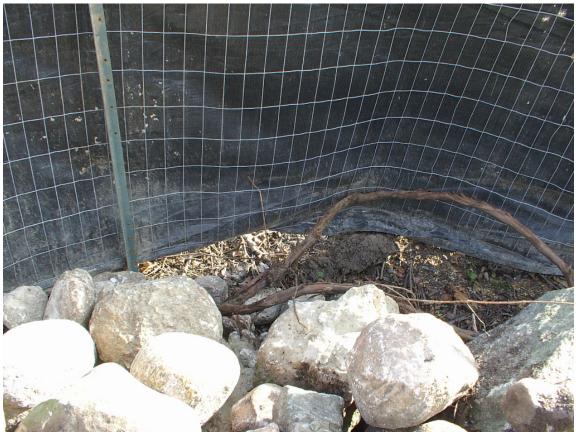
Small section of heavy-duty silt fencing in northeast corner not keyed in
